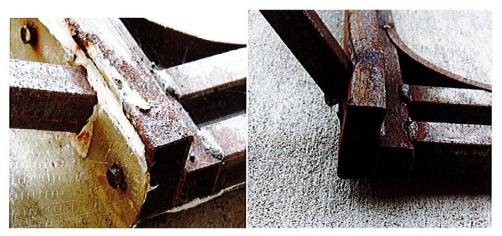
Mode of failure for roof to wall connections at vertical roof member.
